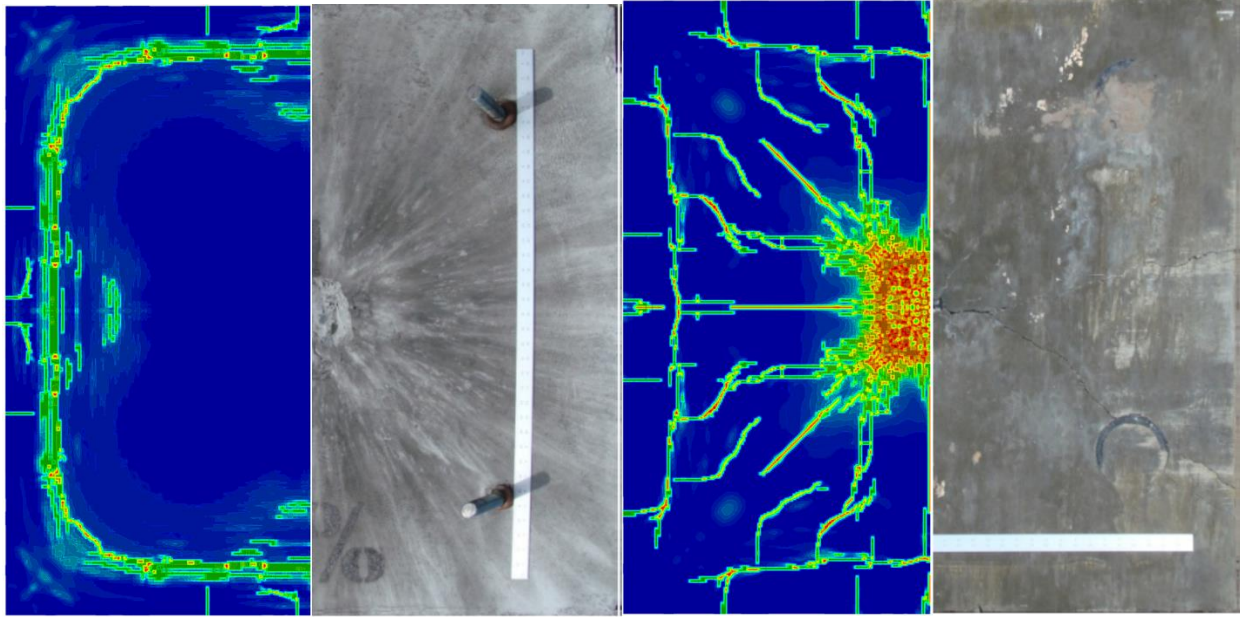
Damage comparison of reinforced concrete slab (Front: left; back: right)
